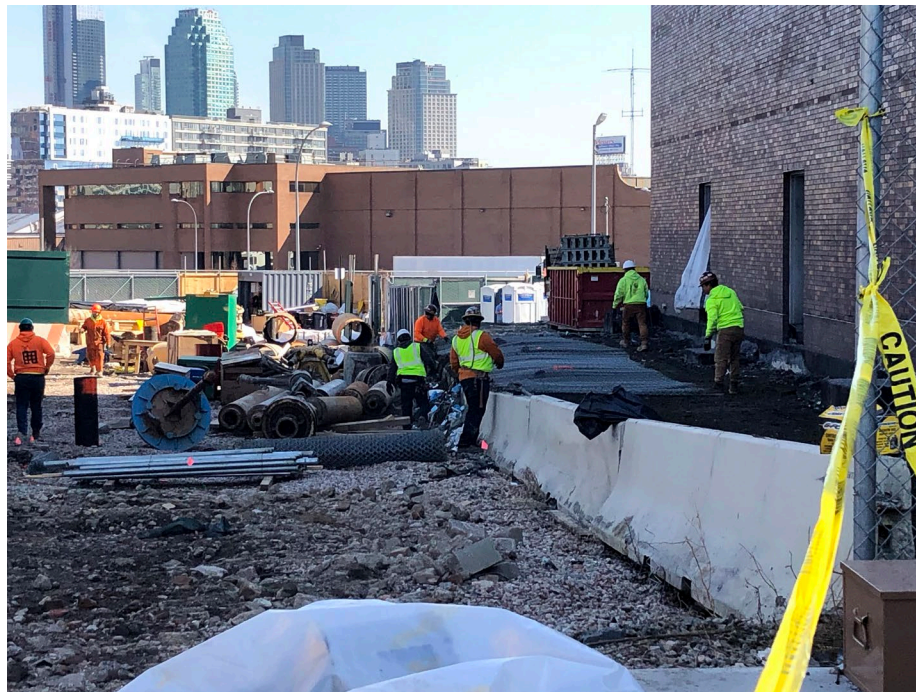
Looking east, New Leaf removing existing fence along the southeast perimeter of site.
